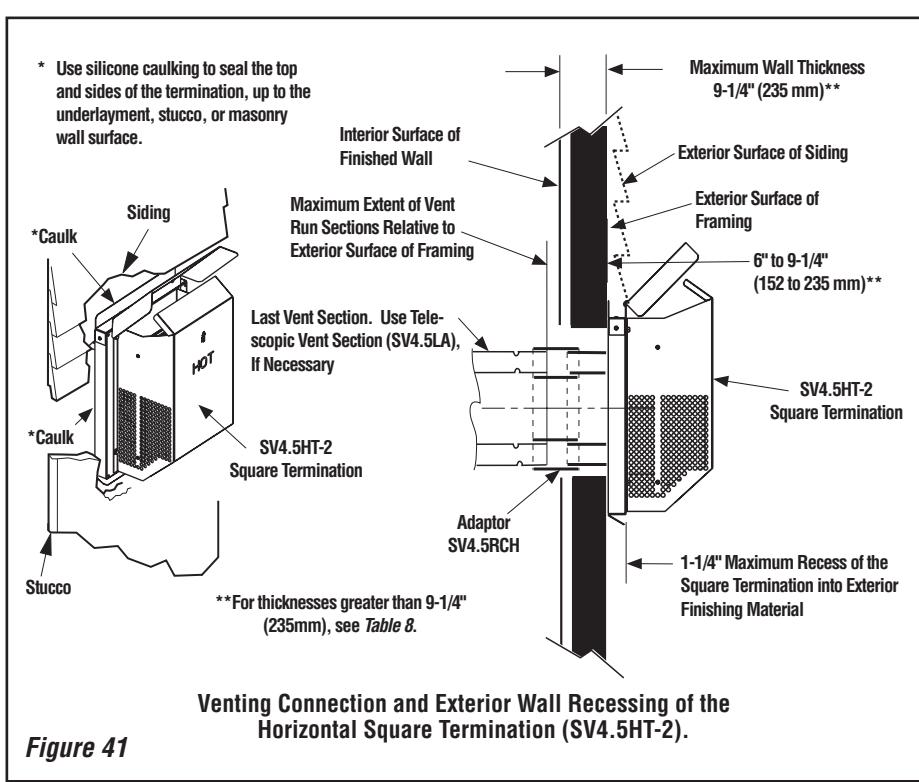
Venting Connection and Exterior Wall Recessing of the Horizontal Square Termination (SV4.5HT-2).
